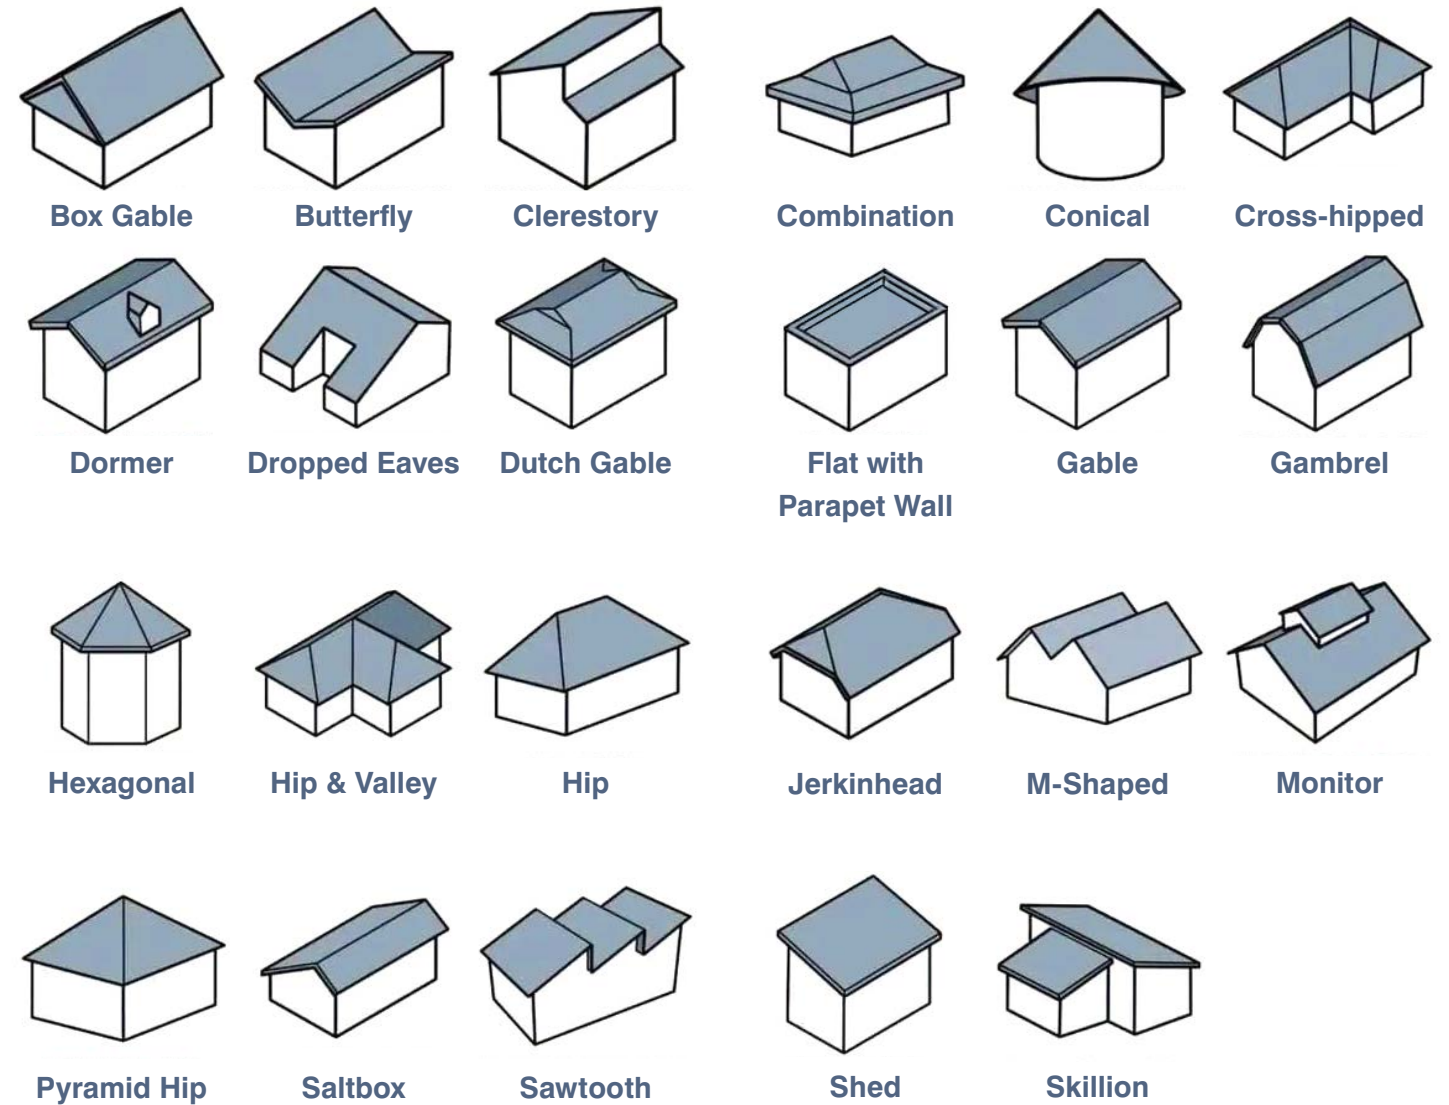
BUILDING ROOF FORM OPTIONS
